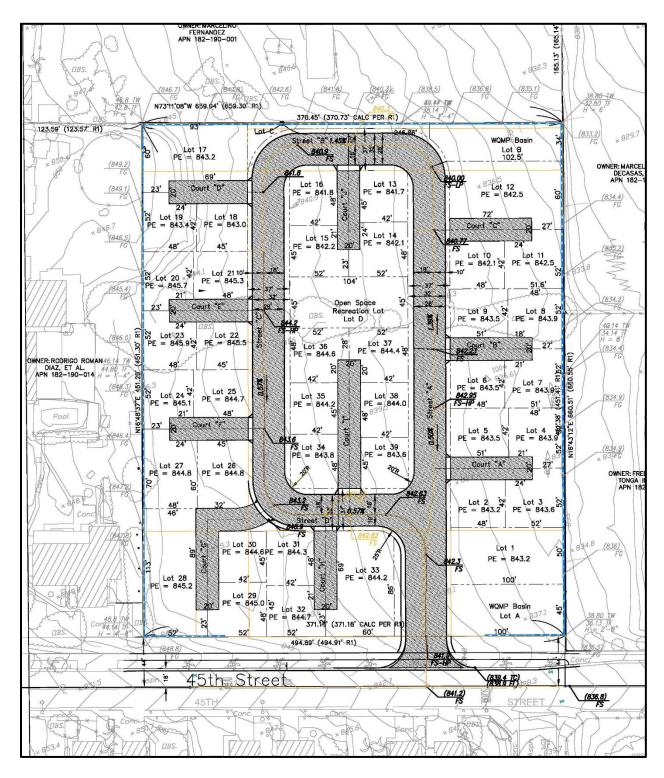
Proposed R,C, Hobbs Companies' Development Plan.
